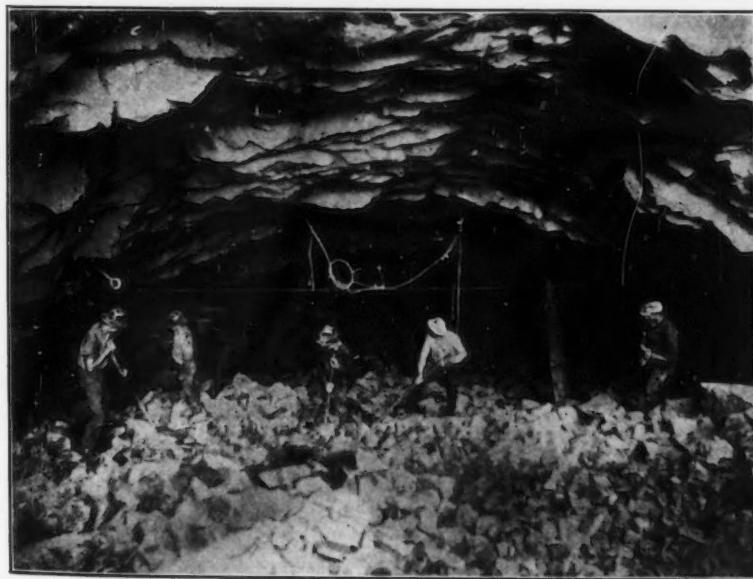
SOLID ROCK, OR TRAP-ROCK FORMATION, AT NEW JERSEY ANCHORAGE.
